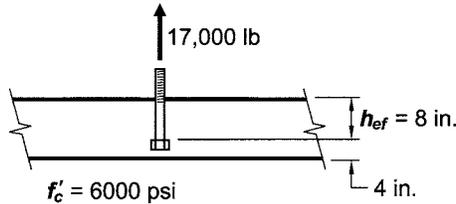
Example 1: Single headed anchor in tension away from edges. (Note: Foundation reinforcement not shown for clarity.)
